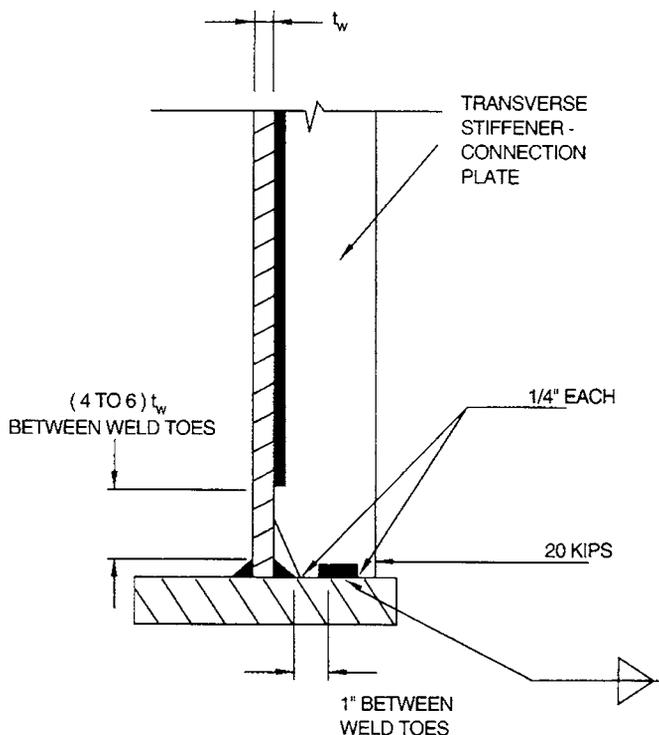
Girder connects to a cross frame through a transverse stiffener.
